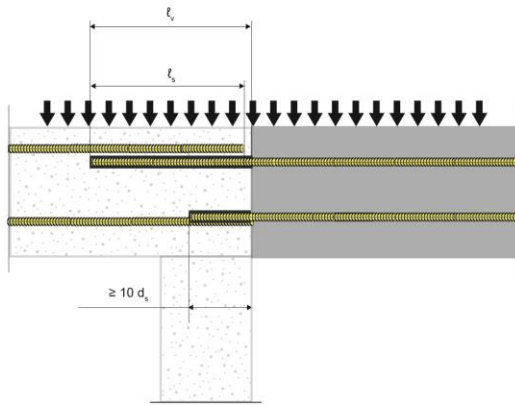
Overlapping joint at a foundation of a wall or column where the rebars are stressed in tension
